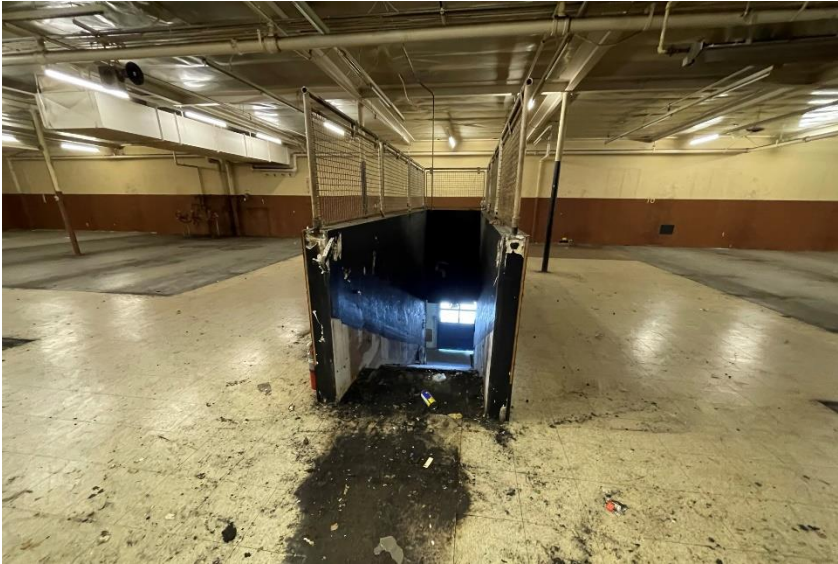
Main auto repair area with trench drain and locations of former hydraulic lifts.
